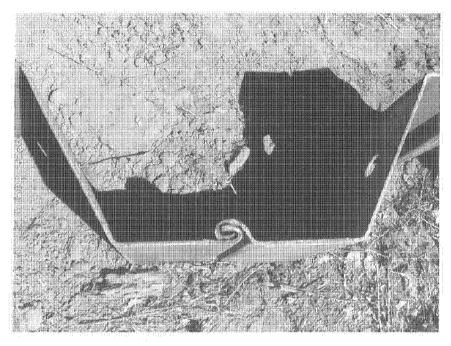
D9 Area – SKZ22 (30' – 0") Sheet Piling Staged for Installation (5/24/2010).
